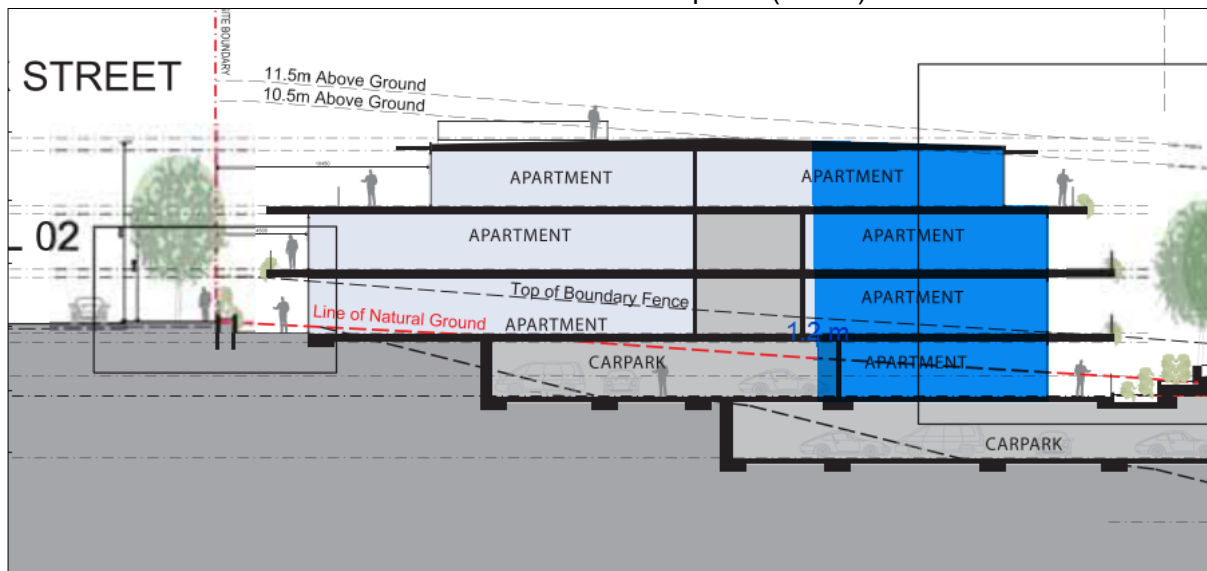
Section A-A Proposed - Showing proposed Four-Storey area of buildings Fronting Fenwick Street highlighted dark blue.
